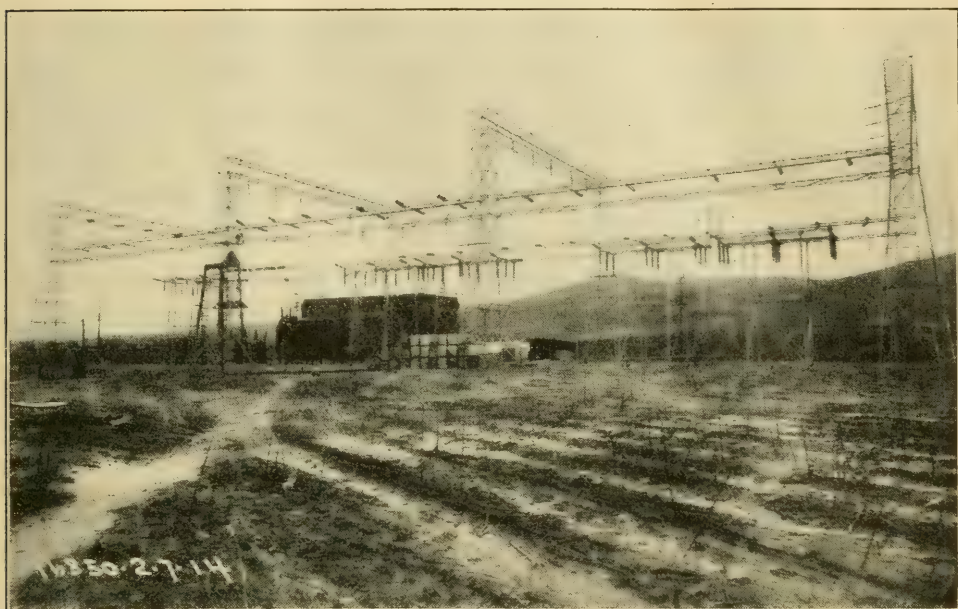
OUTDOOR SUB-STATION AT ANNISTON, ALA.; CONSTRUCTION IS TYPICAL OF ALL SUB-STATIONS.
